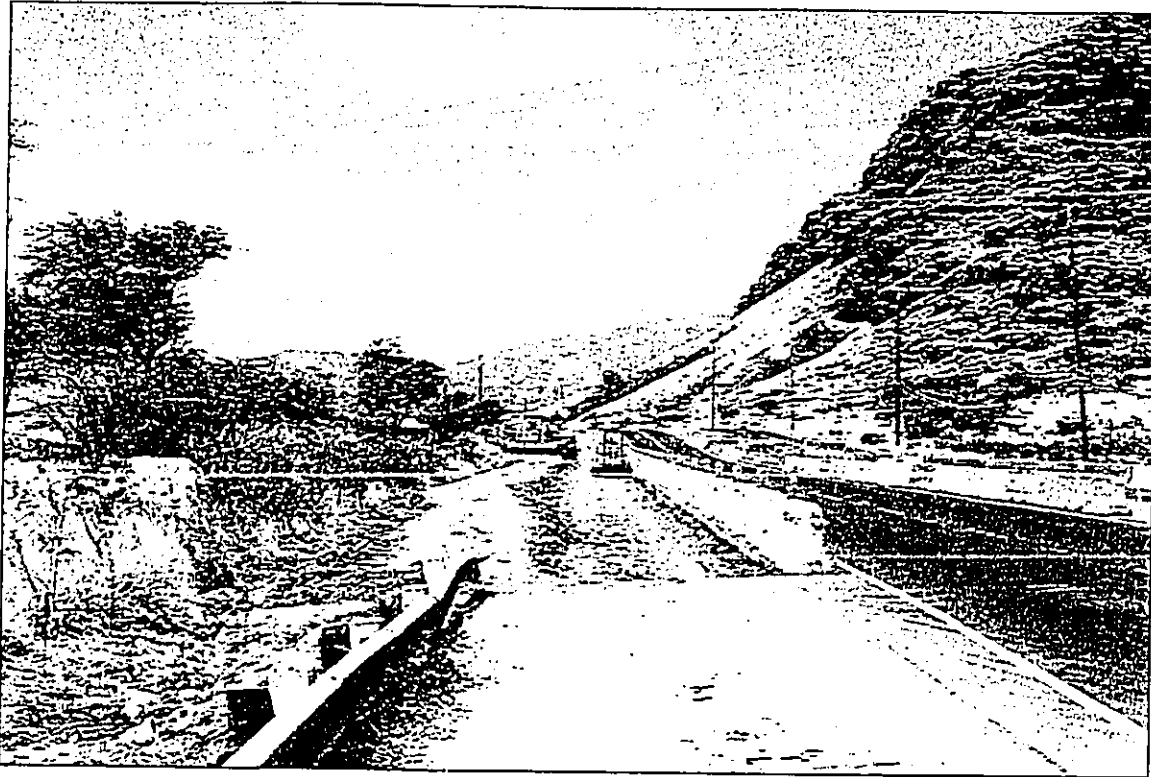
View north-northwest of the inbound shoulder of Farrington Highway. Note the railroad track is present to the left in the photo, along the stand of trees.
